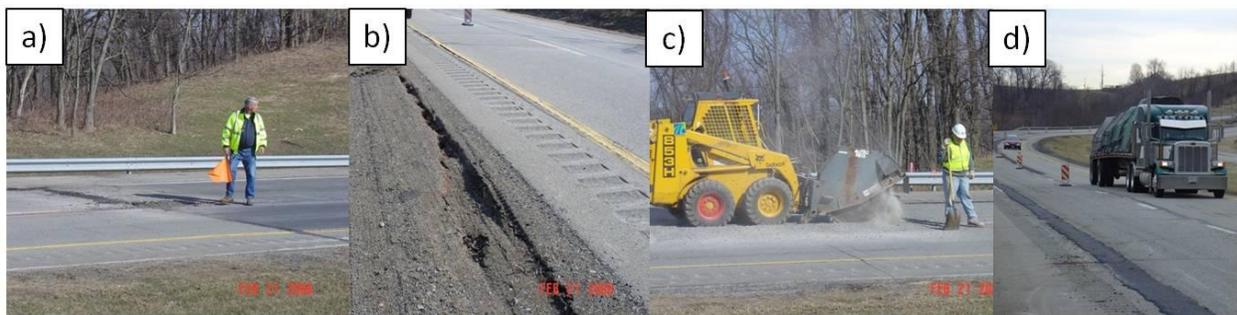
Panel B3 photographs showing (a) a transverse compression heave, (b) lane-to-shoulder separation, (c) blowup compression bump being milled, (d) single lane restrictions with longitudinal patching, February 21, 2006 (Photographs from PA DEP files).
